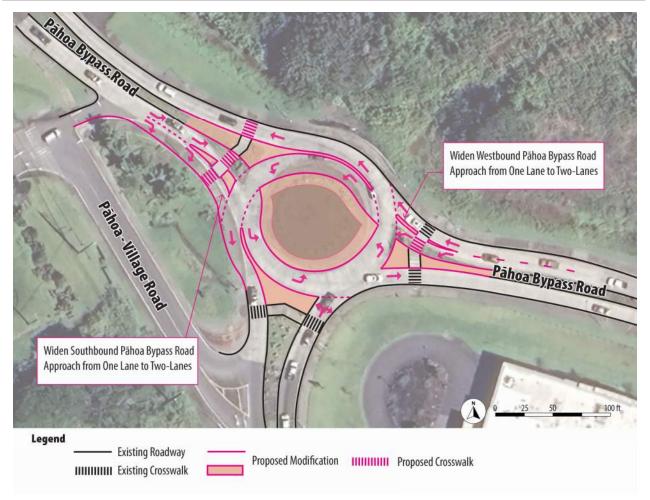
Pāhoa Bypass Road and Pahoa Village Road Modified Roundabout
